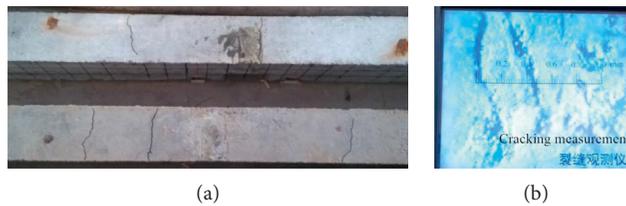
Detecting of the appearance and cracks. (a) Appearance and cracks of beam. (b) Cracks.
